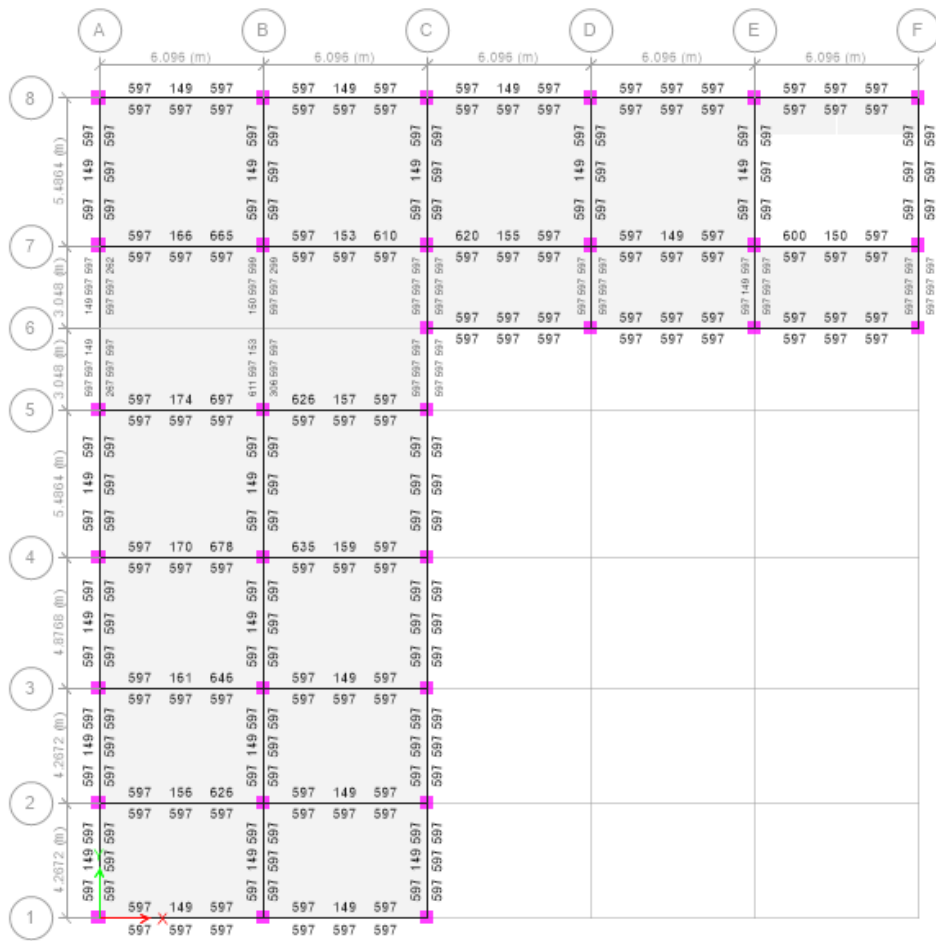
Longitudinal Reinforcement Area of 2nd floor beam
